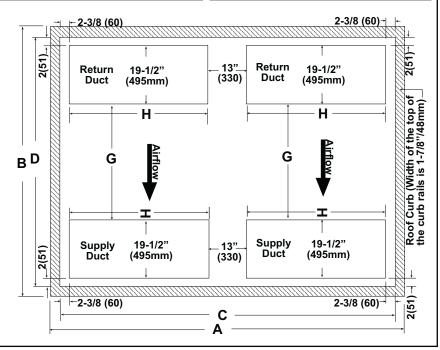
Roof Curb and Bottom Outlet Dimensions -Model RPDBL
